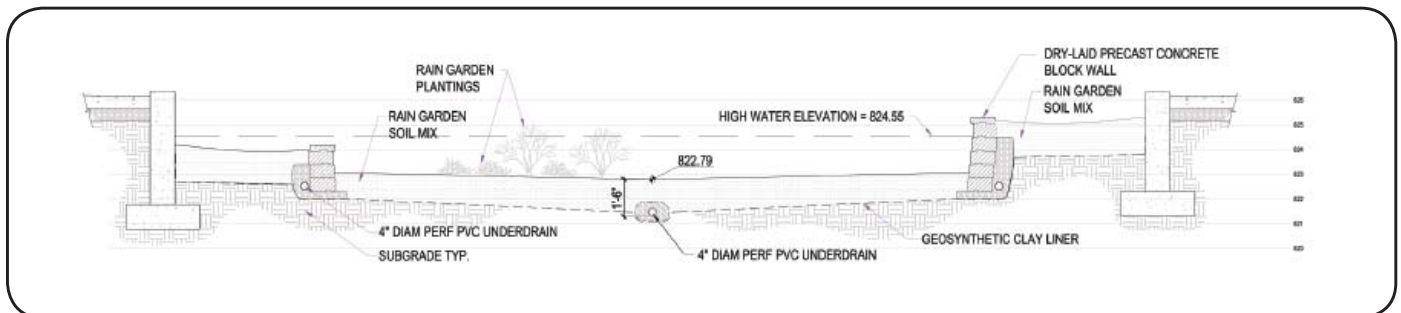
Construction Detail of Rain Garden Proposed in Battle Creek, MI (JJR)
